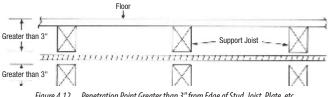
Penetration Point Greater than 3" from Edge of Stud, Joist, Plate, etc.
